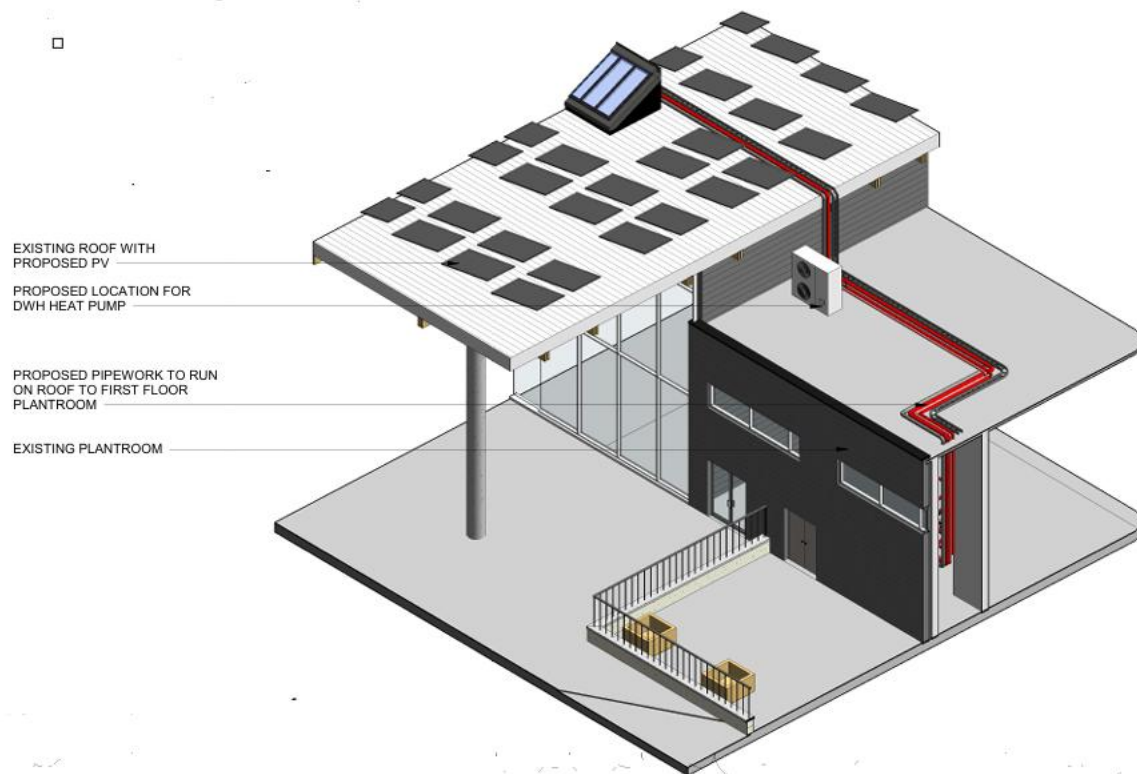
Location of the proposed 1No. DHW heat pump to be located on the roof on the eastern side of the building
